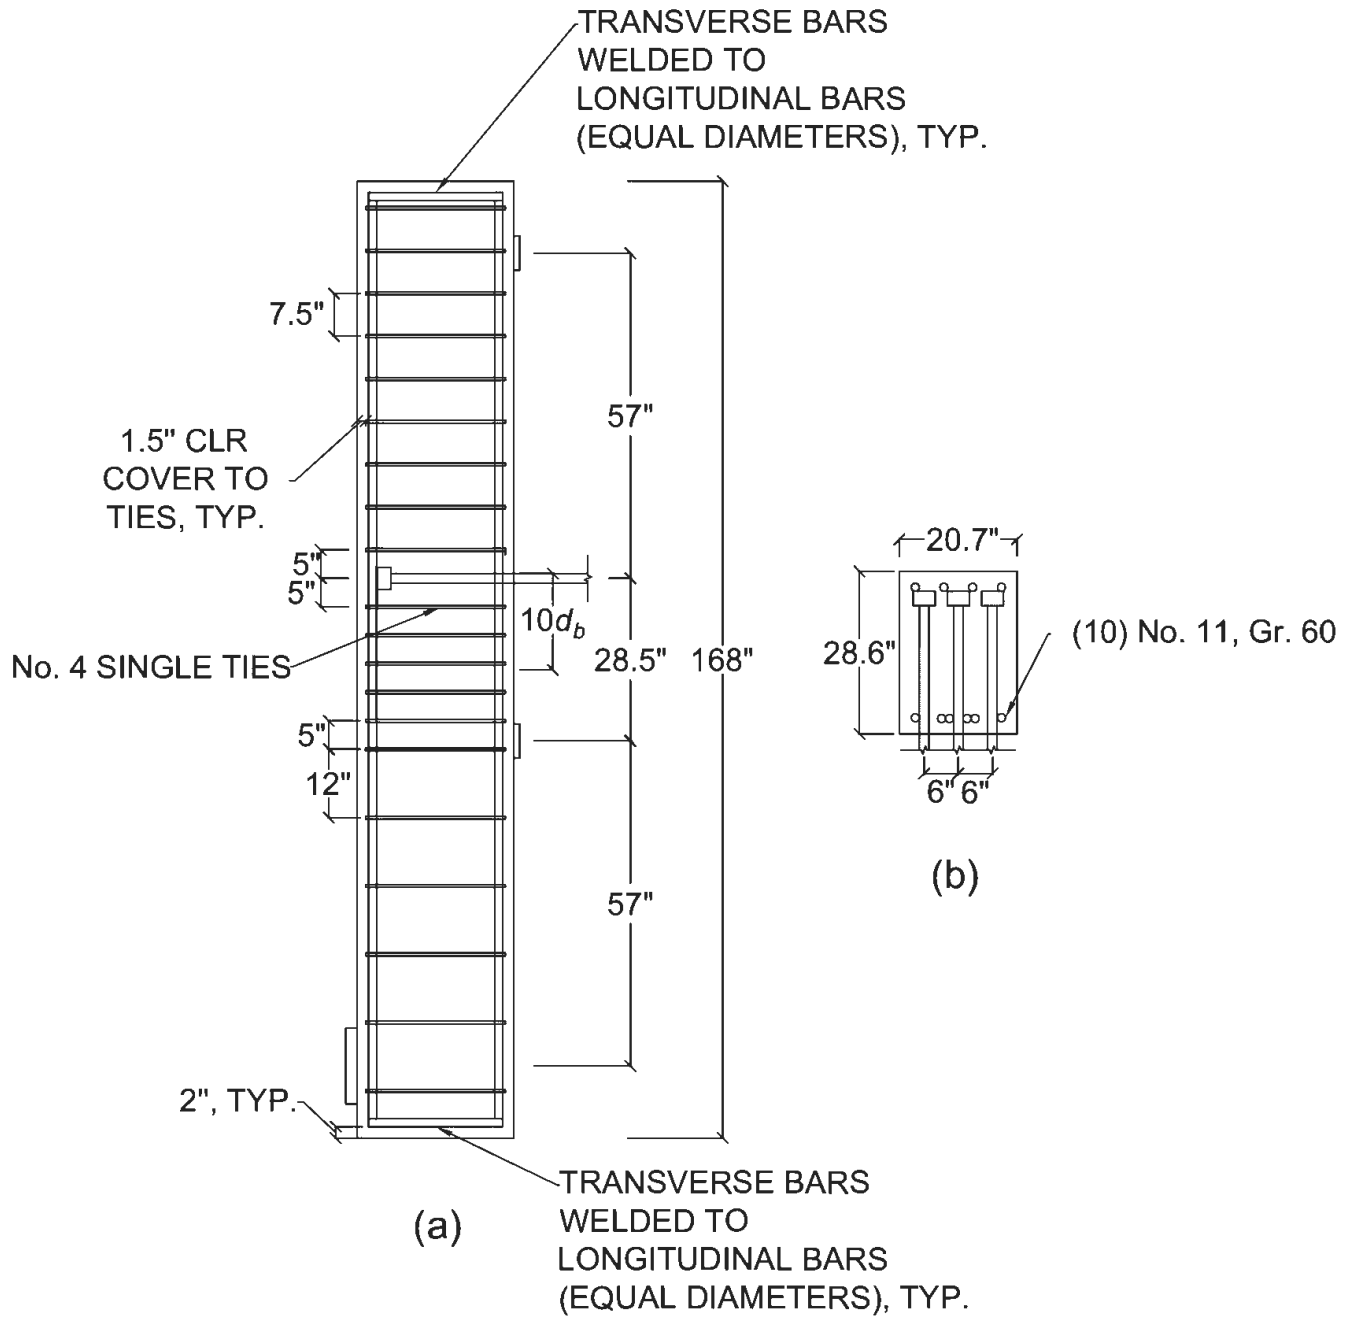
Details of reinforcement layout for No. 14 headed bar specimen 14-5: (a) elevation, (b) cross-section
